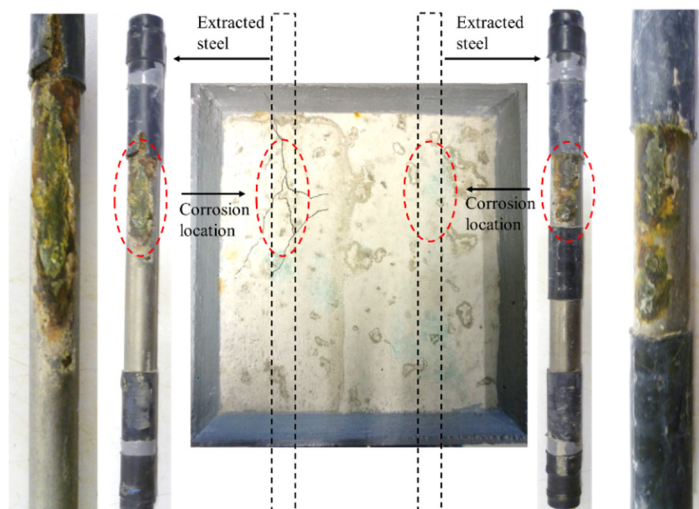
Crack patterns on the concrete surface and corroded steels ('LS' on left side and 'SS' on right side) extracted from samples for CEM I ($w/b=0.6$) concretes.
